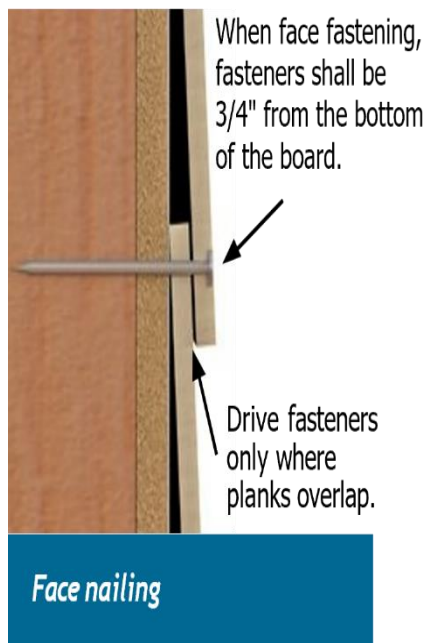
Allura® and TerraPlank™ Lap Siding Face Nail Fastening Details
